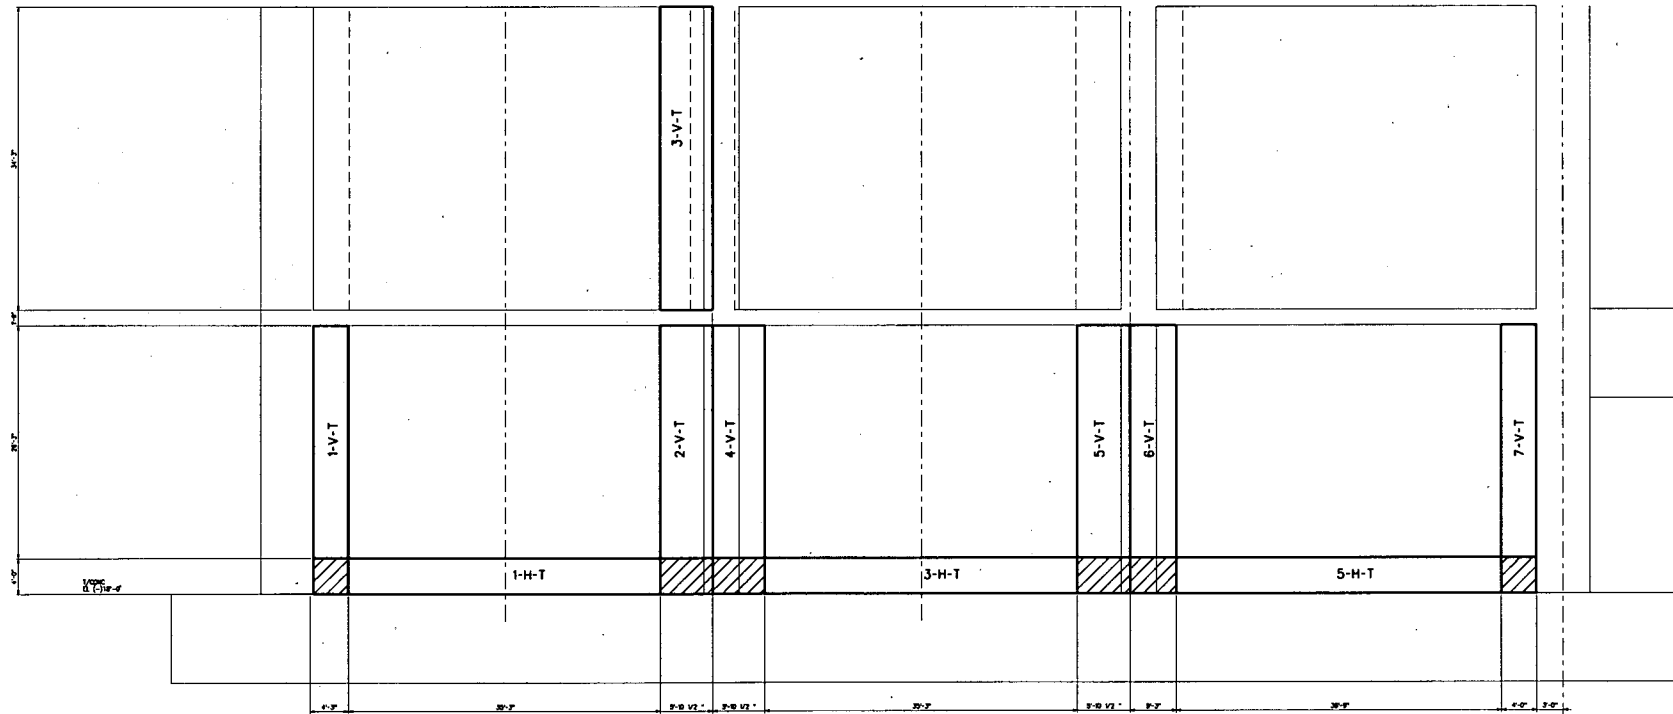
H.6-66: PUMPHOUSE SOUTH WALL LOOKING NORTH
